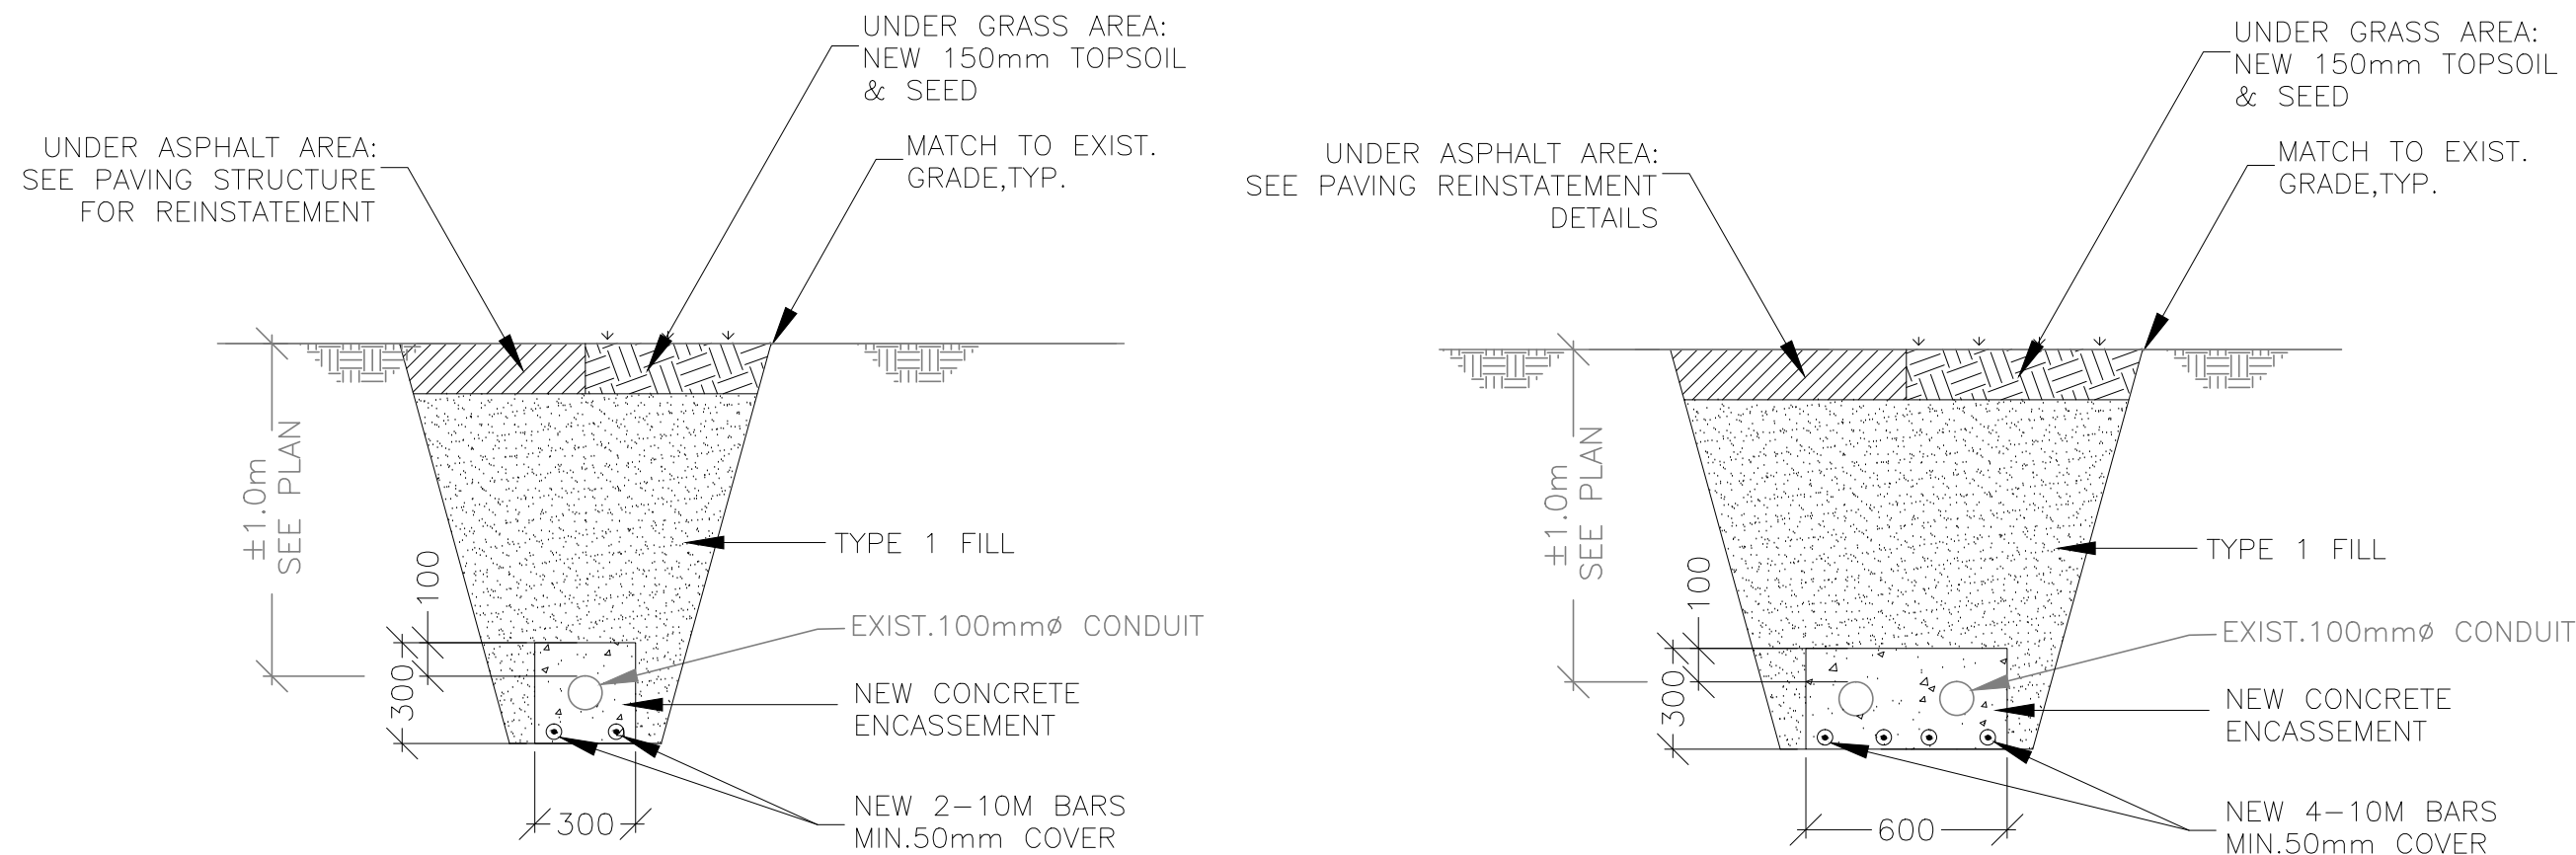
/2 - ENCASEMENT DETAIL EXISTING DUCT
